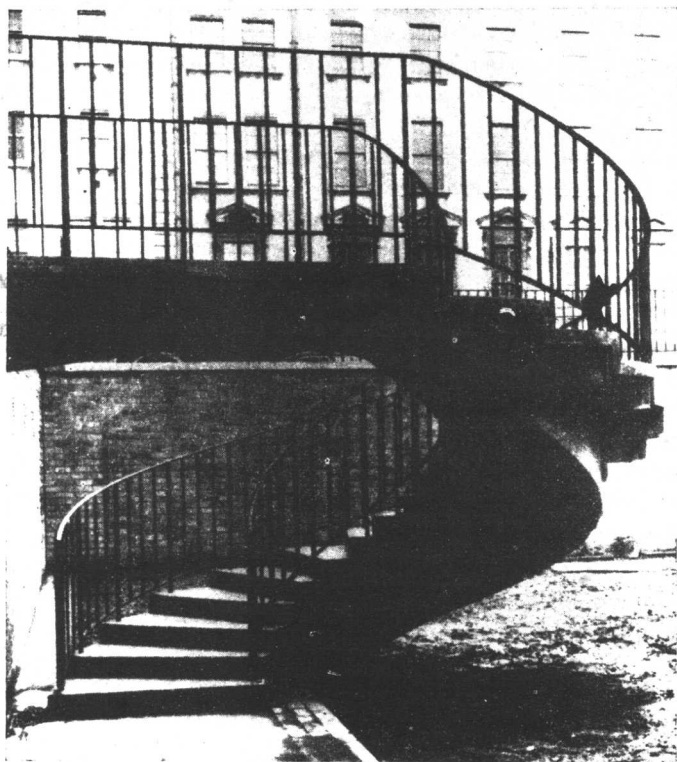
All the skills of the formwork designer and formwork carpenter are called into play when geometrical work and special features are incorporated by the architect and engineer.
